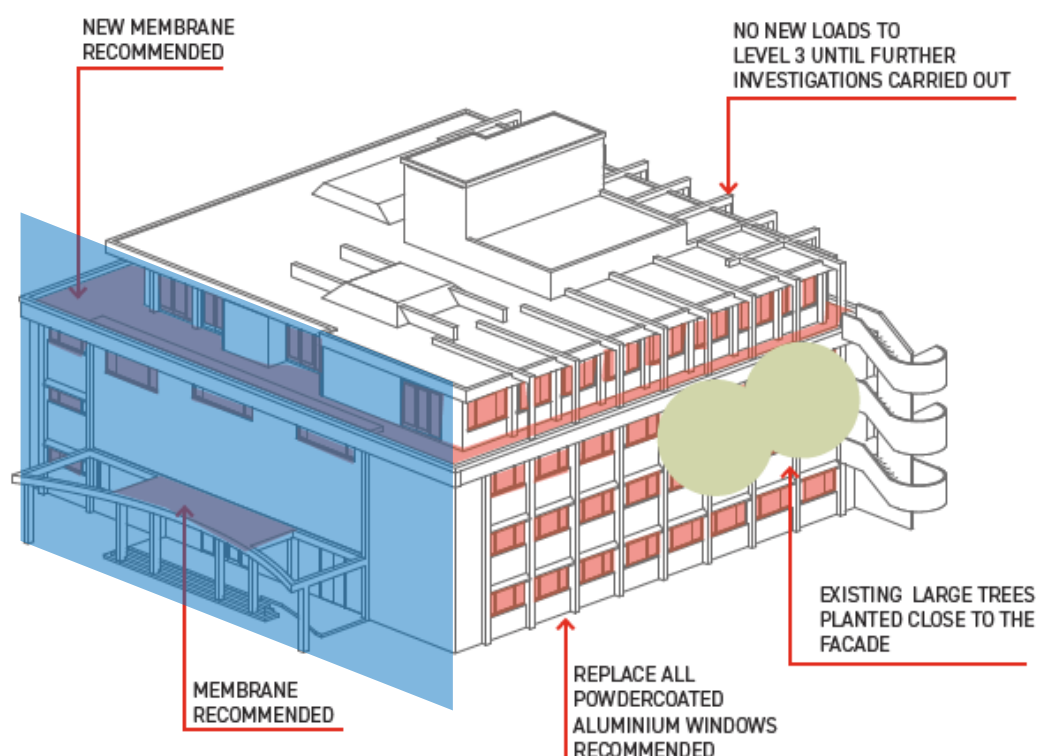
3D model indicating the aluminium windows proposed to be replaced. The northern windows and façade (blue) have been assessed in another Section (Section 7.1.2). Source: Lahznimmo + Antelope with Curio additions, 2021
